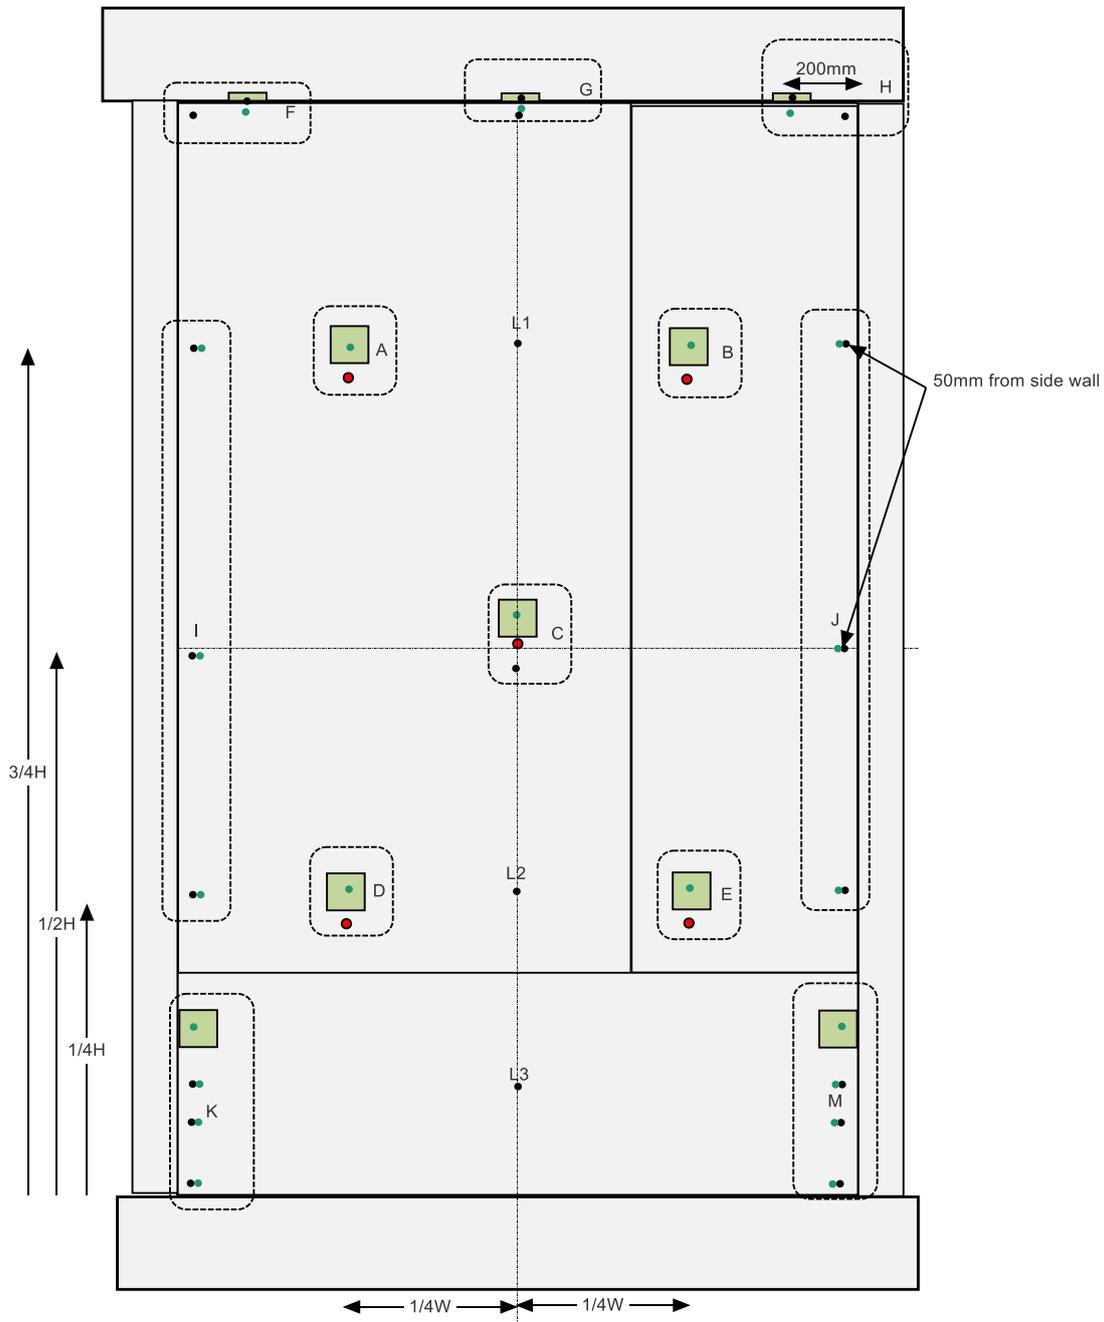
Elevation of west wall of reference building showing instrumentation of building facing the simulated fire source.
